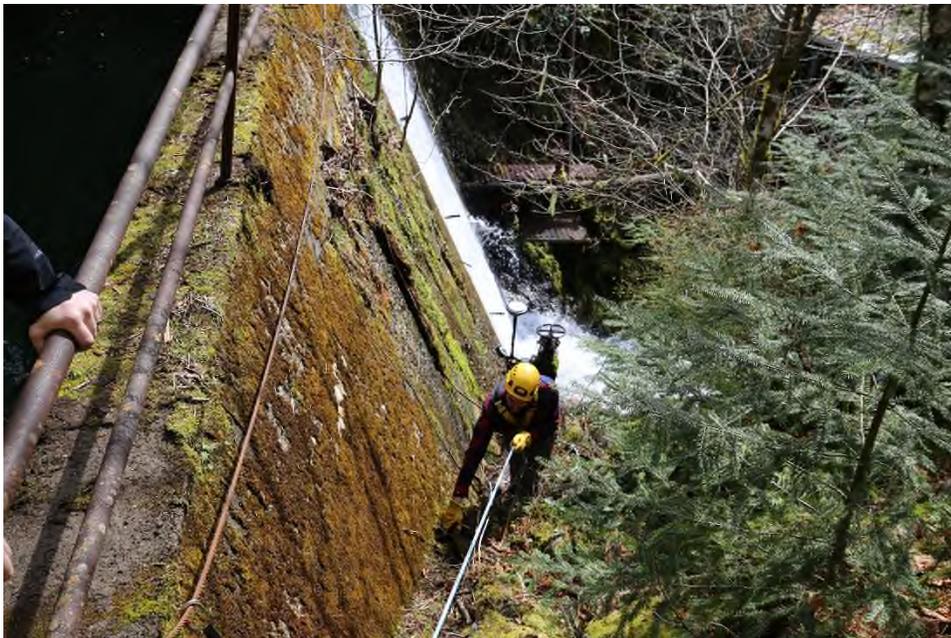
Downstream face of the dam as viewed from above at the right abutment.
